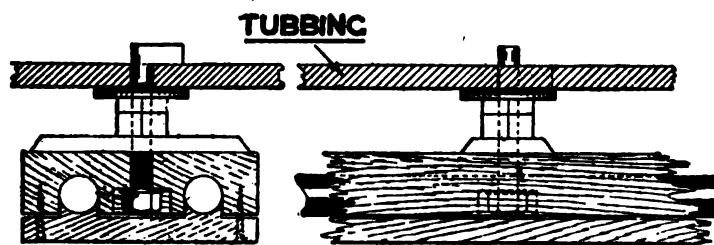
Showing Messrs. Callender's Cable Cleat, for two Cables, for bolting to the Brickwork of a Shaft.
